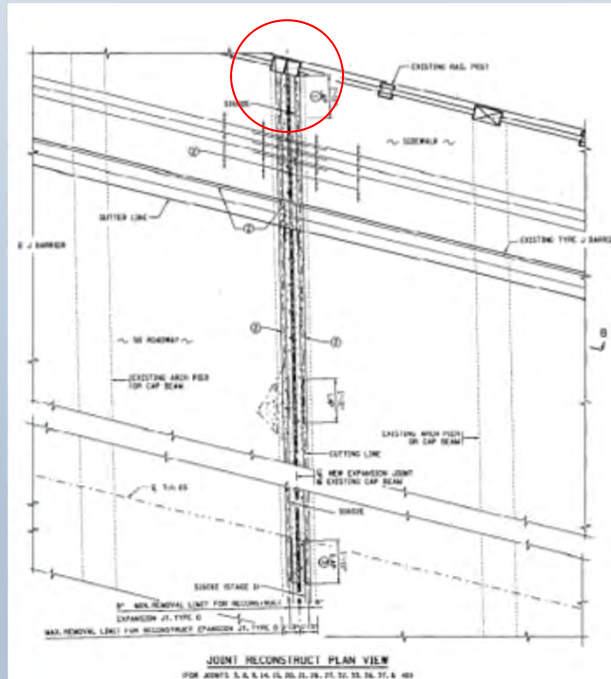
Half-deck plan showing strip seal joint in roadway and sidewalk for joints located adjacent to arch piers.
